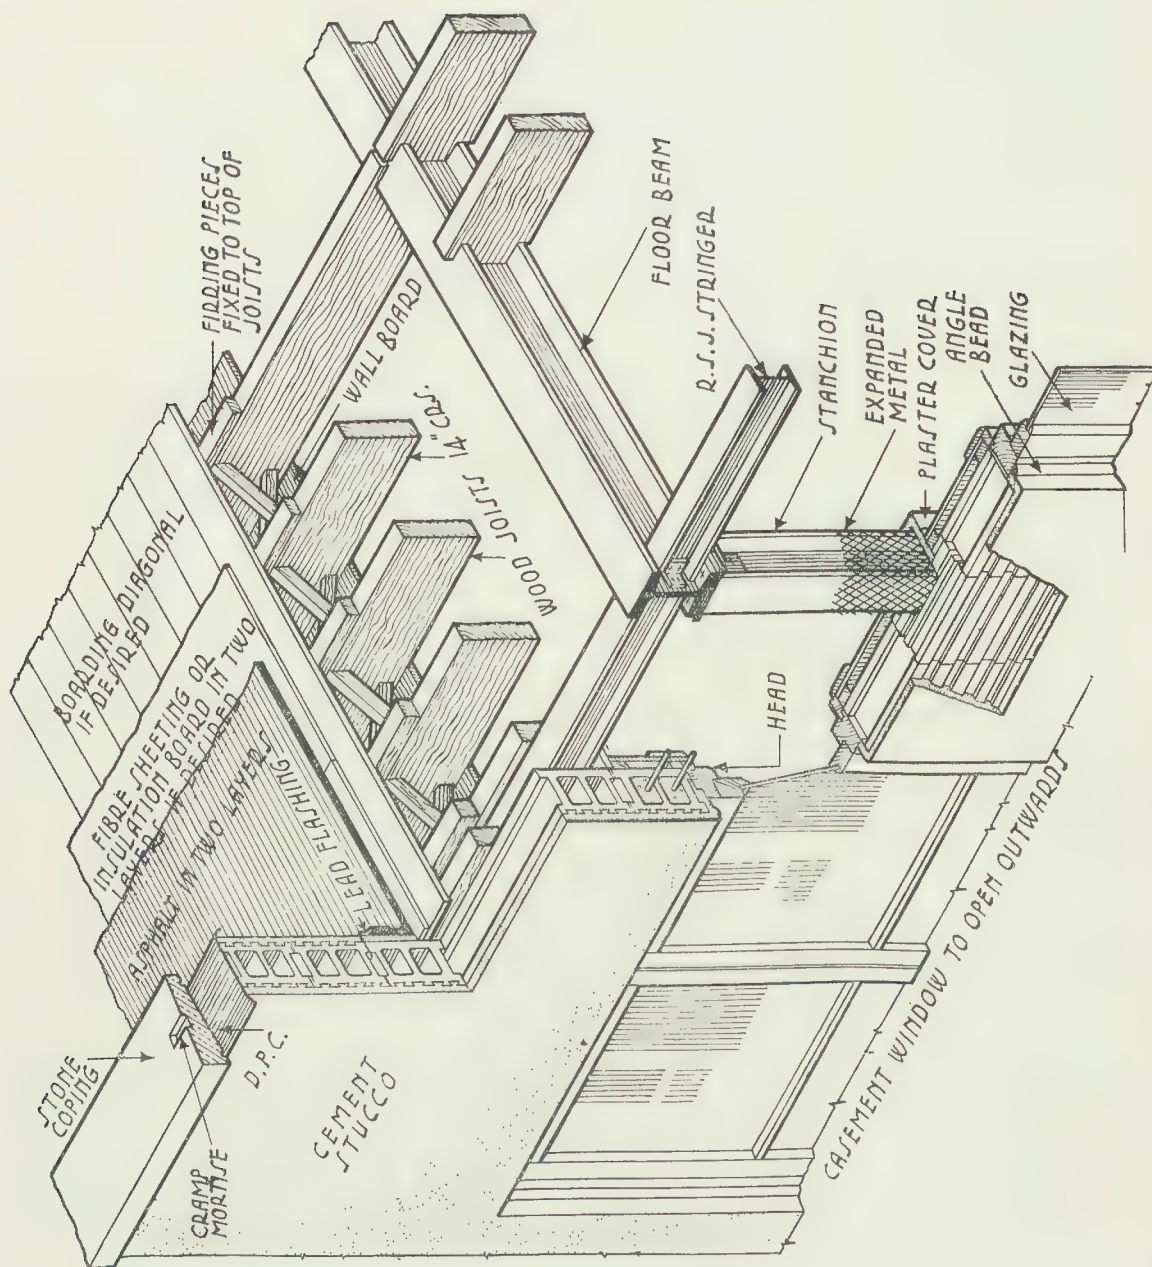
CONSTRUCTION OF TIMBER FLAT ROOF
